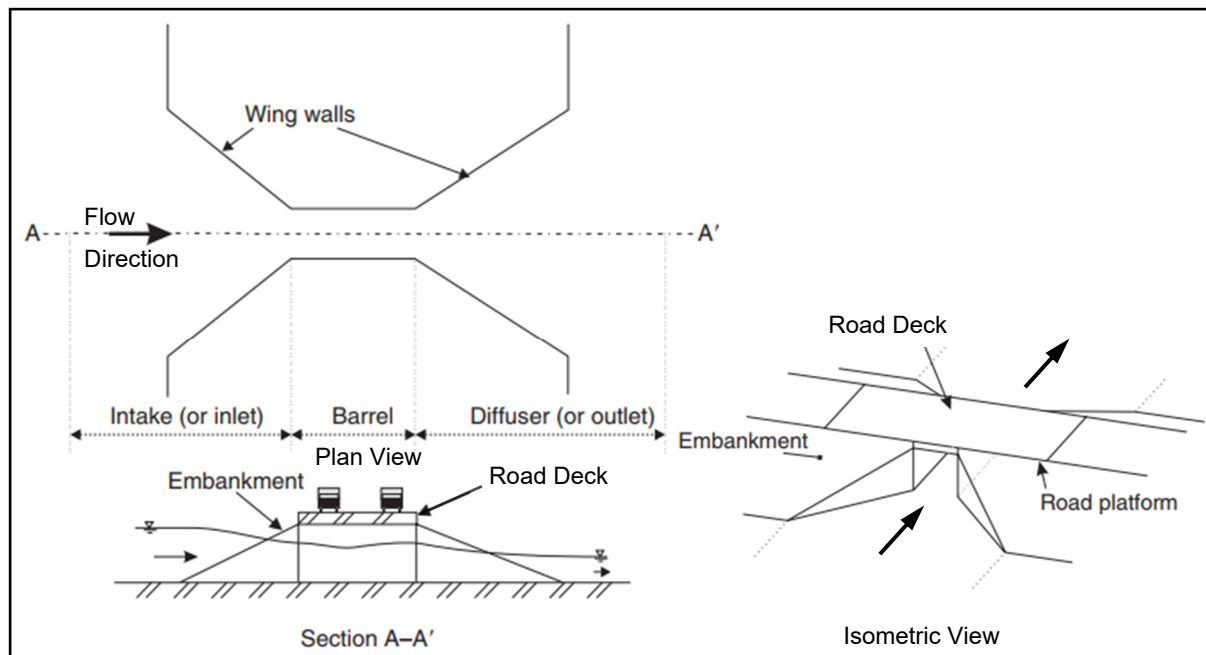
Schematic layout of rectangular culverts and all its components (Chanson, 2002).
